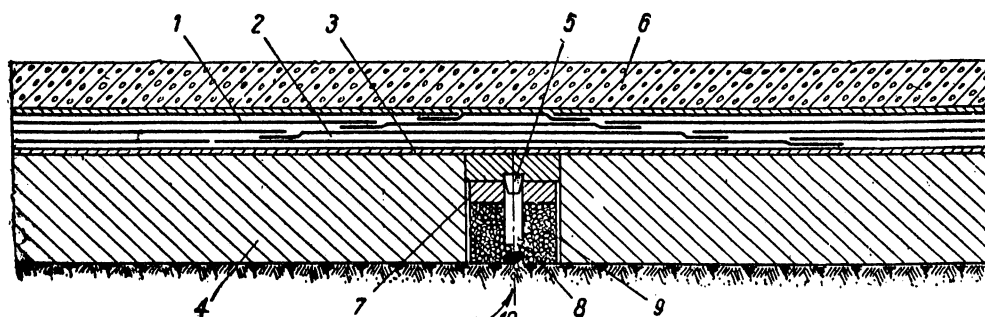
Sealing the Concrete Slab of a Shelter Floor
